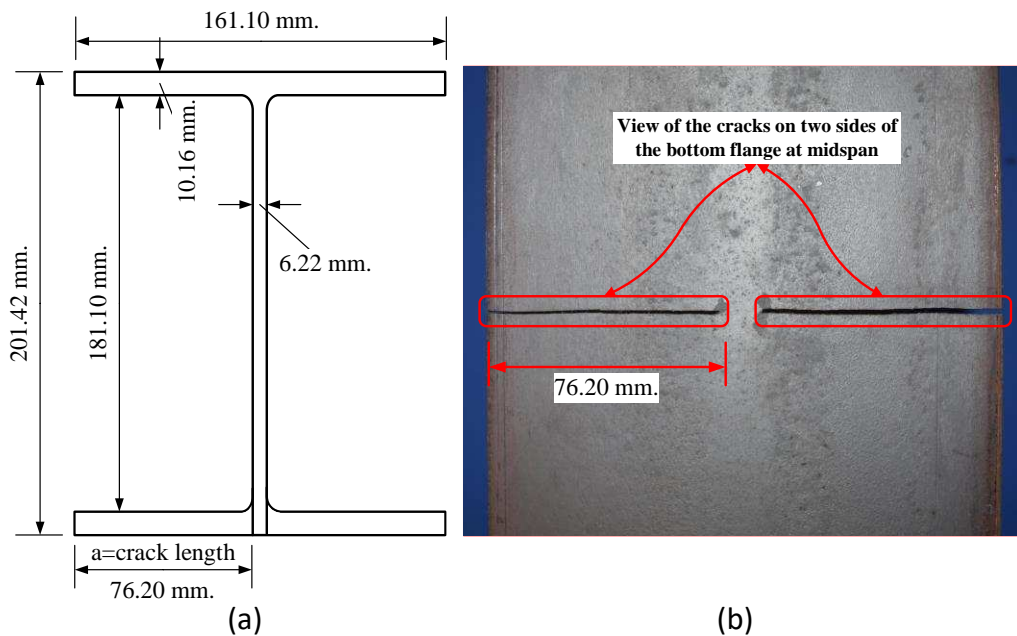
(a) cracked cross section dimension of the specimens (b) cracked bottom flange view
